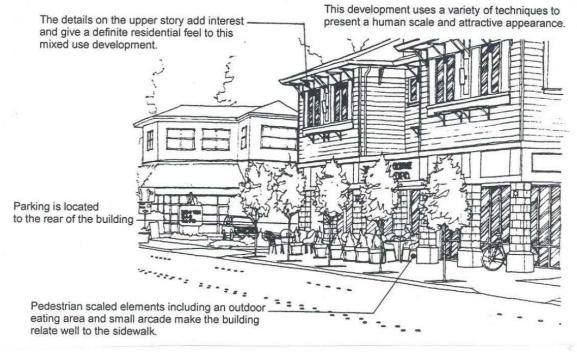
(e). The quality of downtown Kingston's identity depends on the view from the street. New development should be oriented and designed to provide pleasing, pedestrian-oriented streetfront. The example above shows a few ways this can be achieved.
